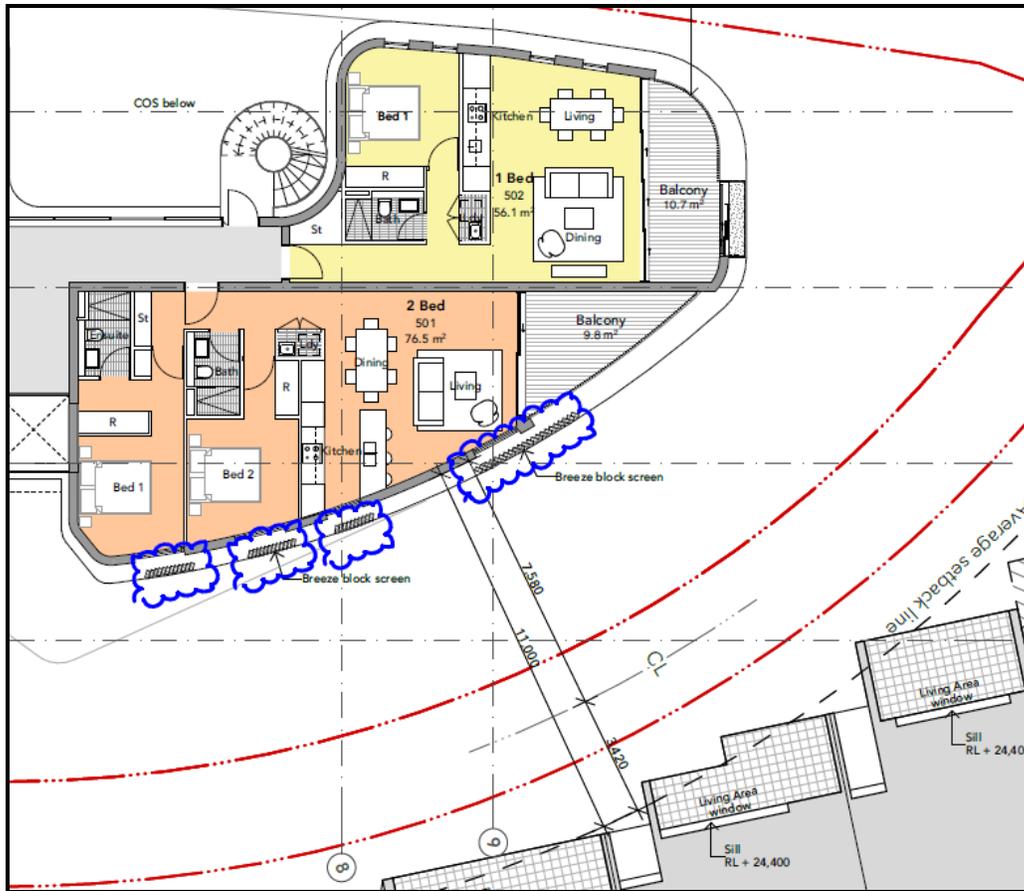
Excerpt Level 5 illustrating typical amended privacy treatment to units in proximity to No. 14 McGill Street
